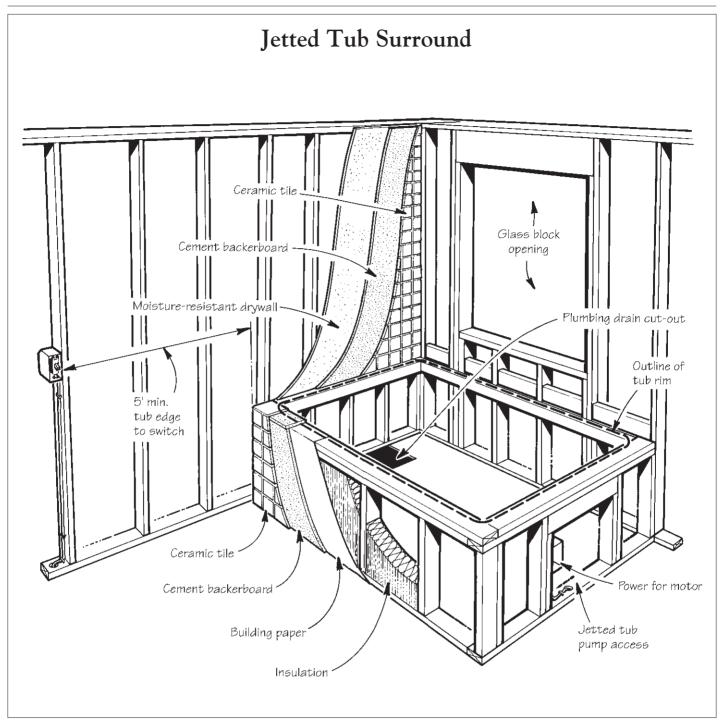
A typical tile tub surround, by the author, has sturdy 2x4 framing and is insulated to reduce heat loss and noise. Make sure you leave a convenient access panel for maintenance and repair of the pump system. Also, keep electrical switches at least 5 feet from the tub.
